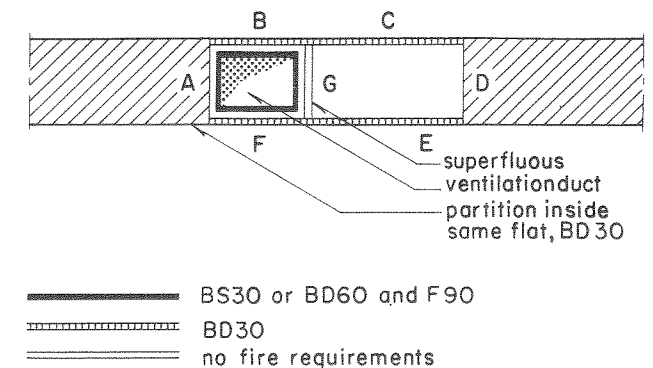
Pipe space service unit inside same flat; fire requirements at multistorey dwelling houses
